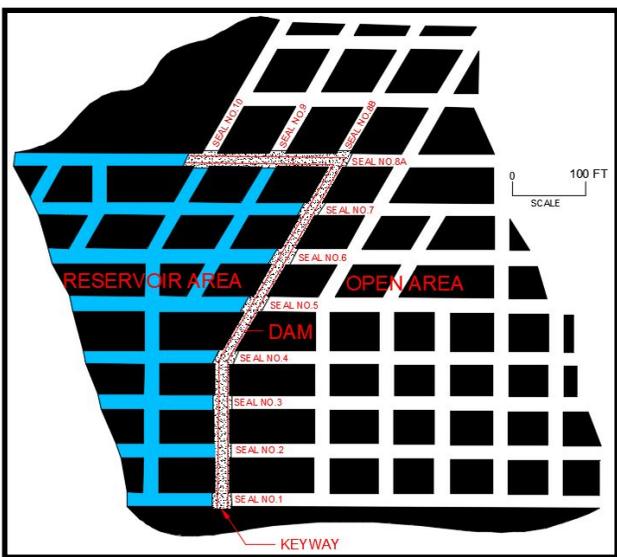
PLAN VIEW OF THE CONCRETE BULKHEAD
